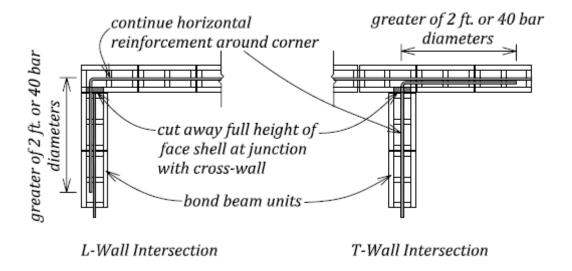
Horizontal reinforcement at the web-to-flange intersection: TCCMAR recommendations.
